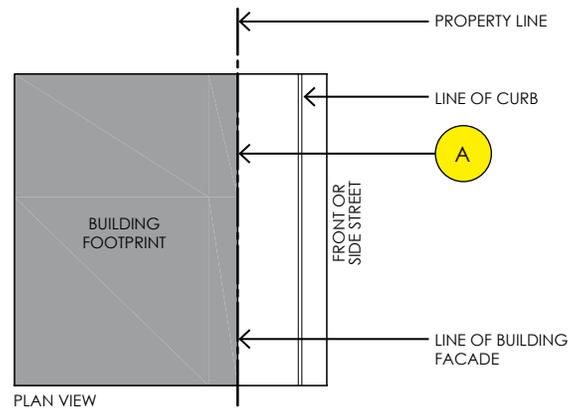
MIXED-USE BUILDING WITH BALCONY-STOREFRONT
